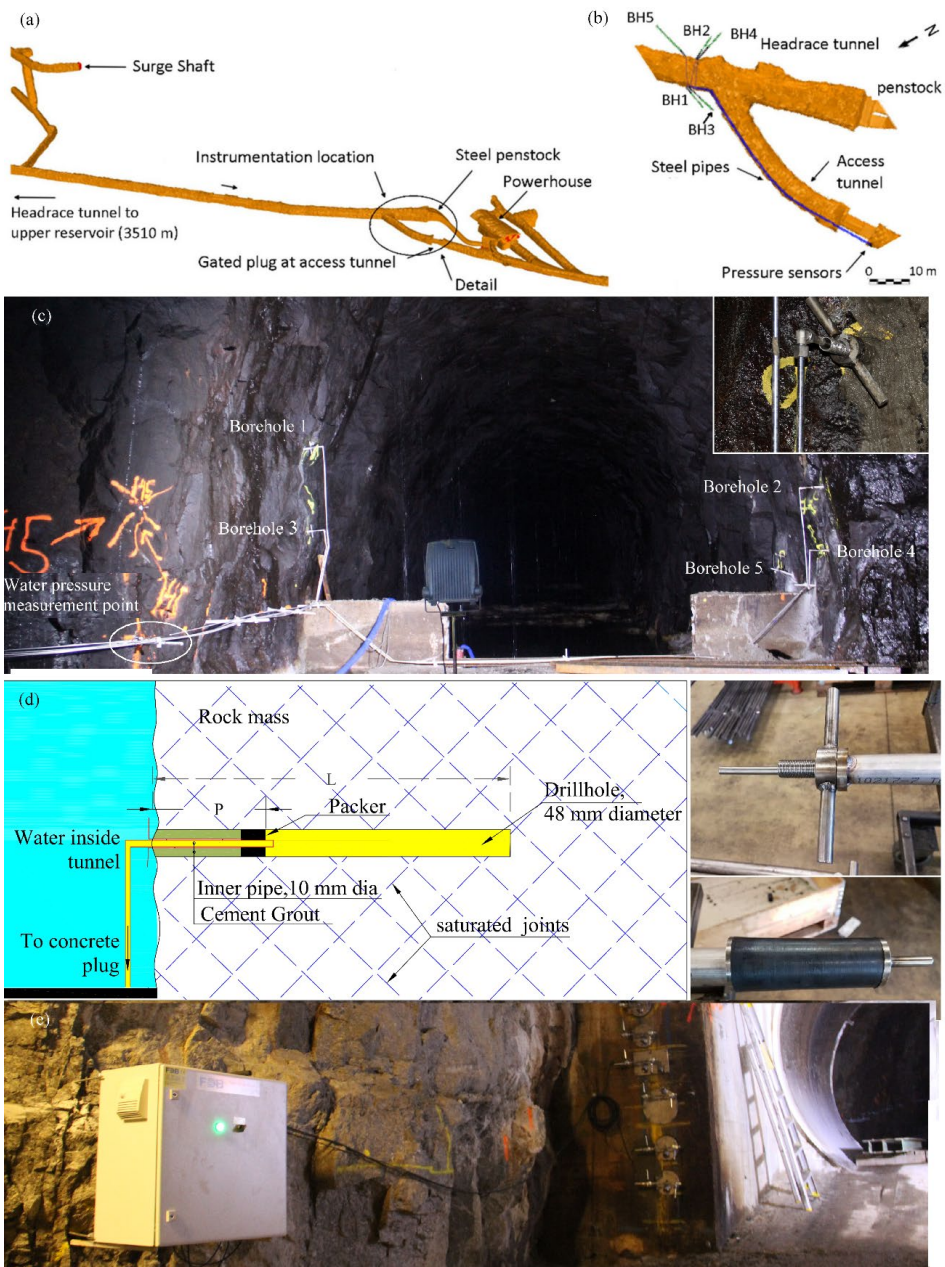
Instrumentation location (a) and detailed view of the setup (b) setup inside the tunnel (c), borehole arrangement (d) and pressure sensors and datalogger in the access tunnel (e) respectively.
